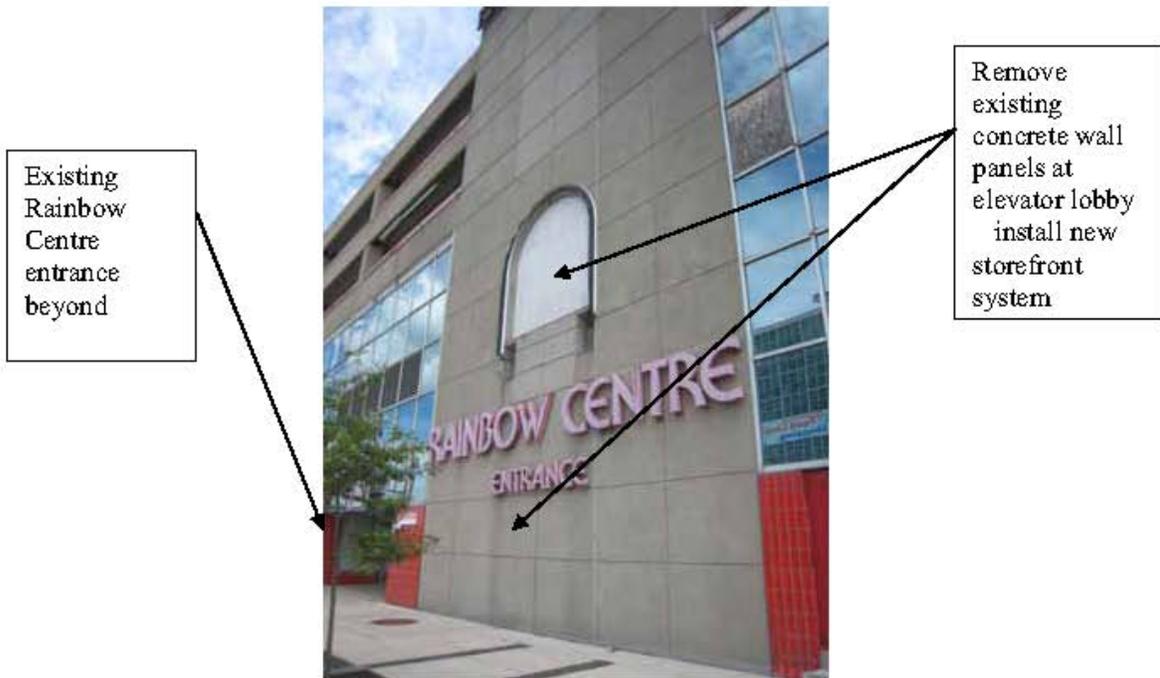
View of existing Rainbow Centre façade along Rainbow Boulevard
